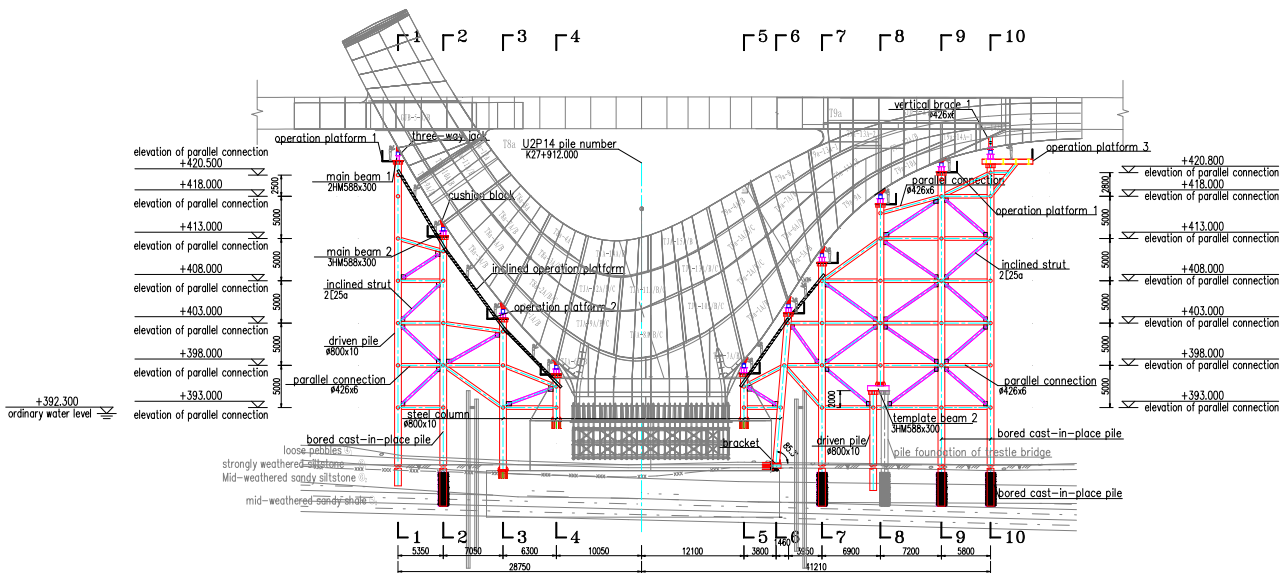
The elevation layout of the assembling support of the V-shaped lower tower columns on the upstream side
